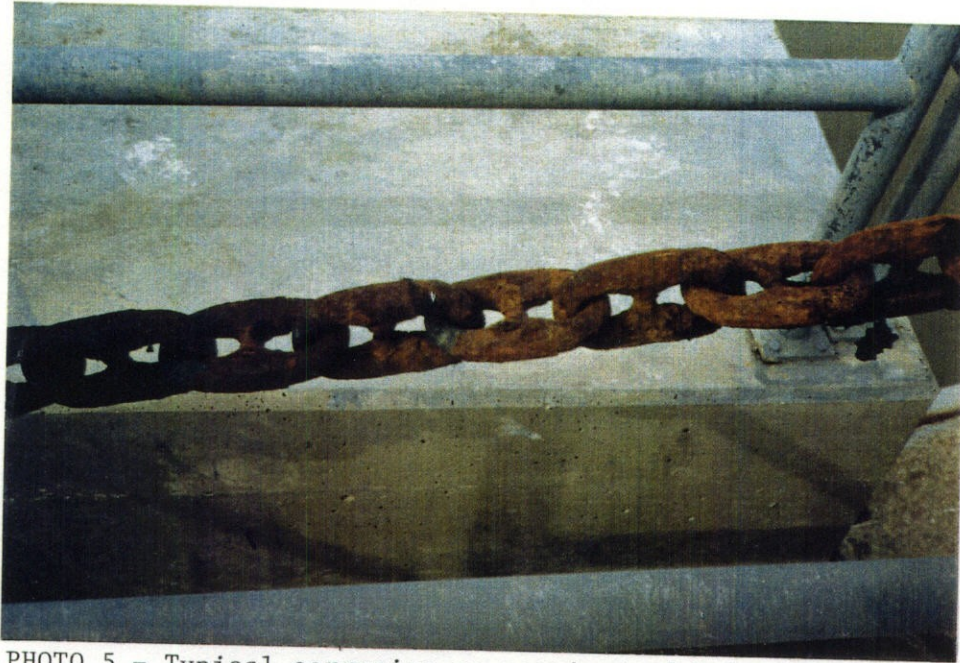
Typical corrosion on sections of hoist and counterweight chains in the splash zone
